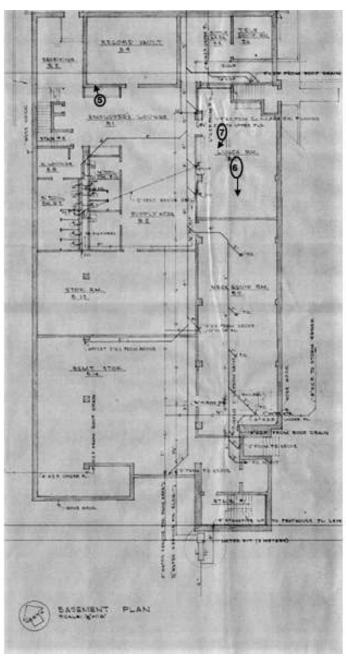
Floor Plan, Basement. Source: E.M. Harris Construction Company, St. Louis, MO
